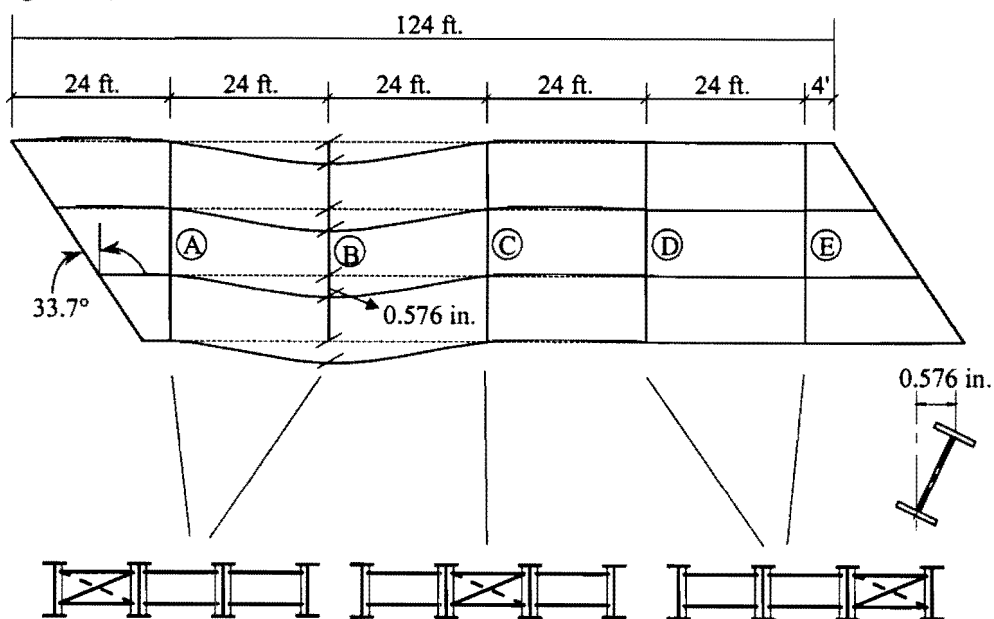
Imperfections for the Four-Girder Bridge with Lean-On Braces
